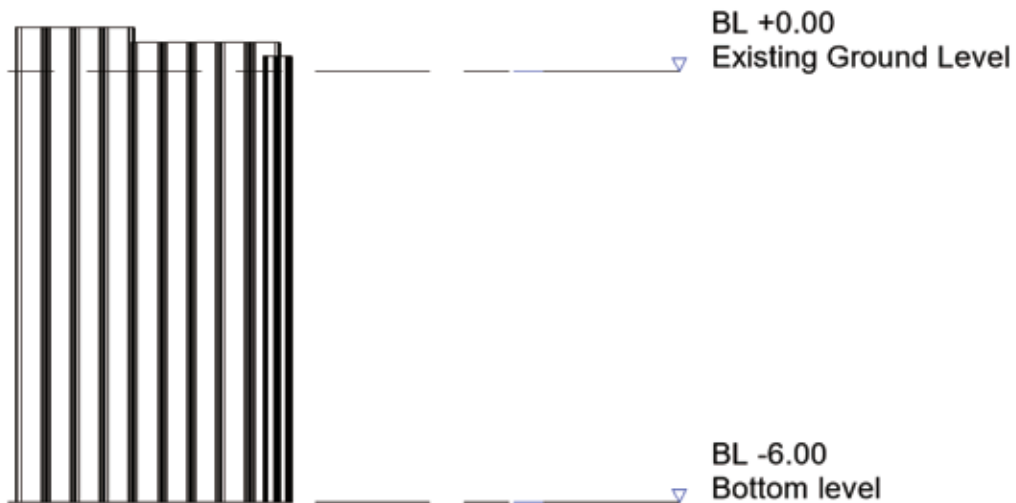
Elevation View of Steel Sheet Piling
